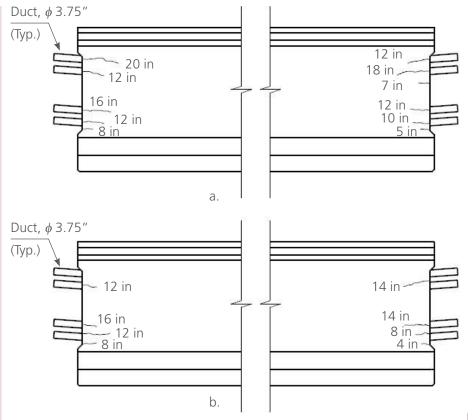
Crack pattern of drop-in girders, (a) Girder 2-2 NB, (b) Girder 2-3NB (1in =25.4 mm)
